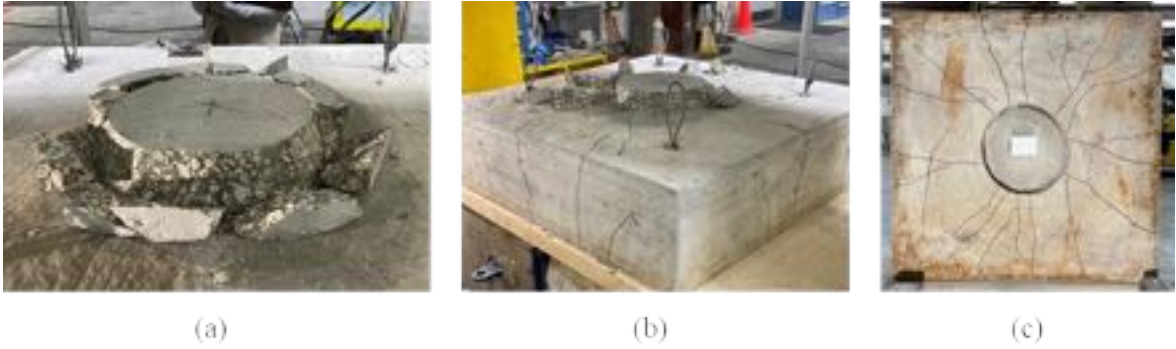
Failure and cracking pattern of Specimen LP-1 (a) plug detail, (b) south-east view and (c) bottom view.
